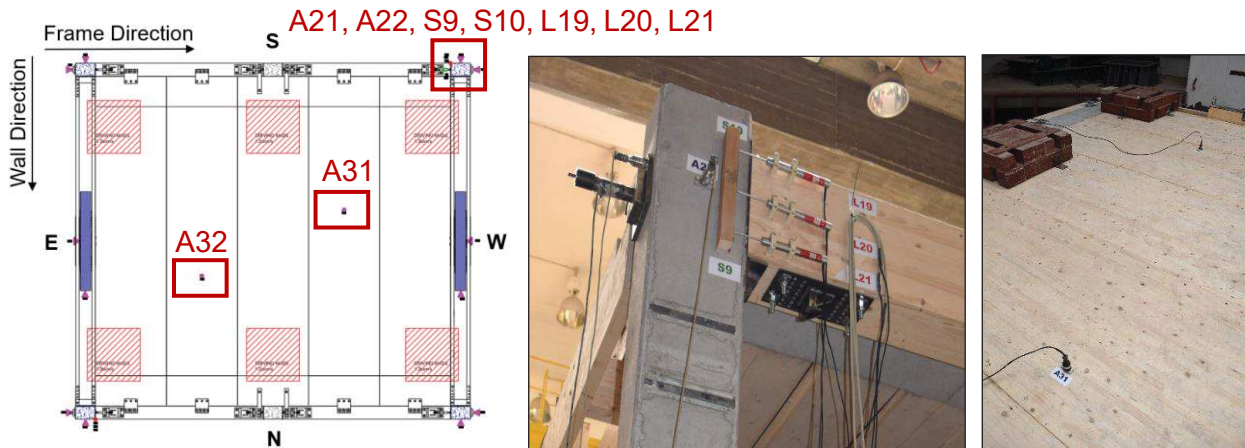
Monitoring system of the second level: external joint in the South-West corner (centre) and accelerometers on the flooring system (right).
